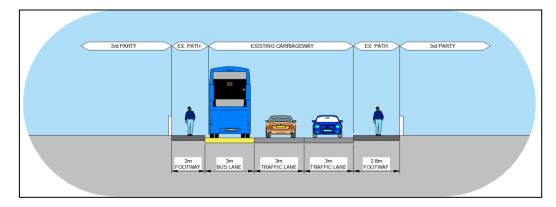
CG1e Typical Cross Section for Crumlin Road
